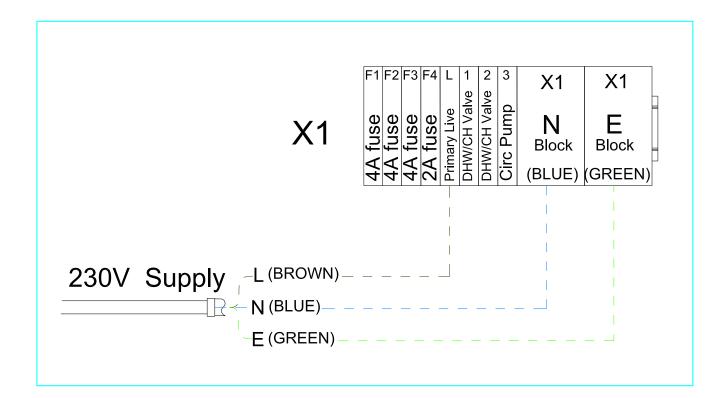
Primary Electrical Connections, Live, Neutral & Earth
